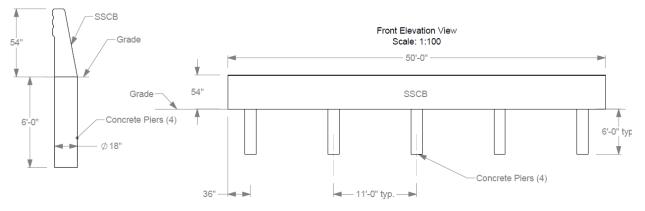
Drilled Shaft Foundation with Five 6-Ft Long Drilled Shafts.
